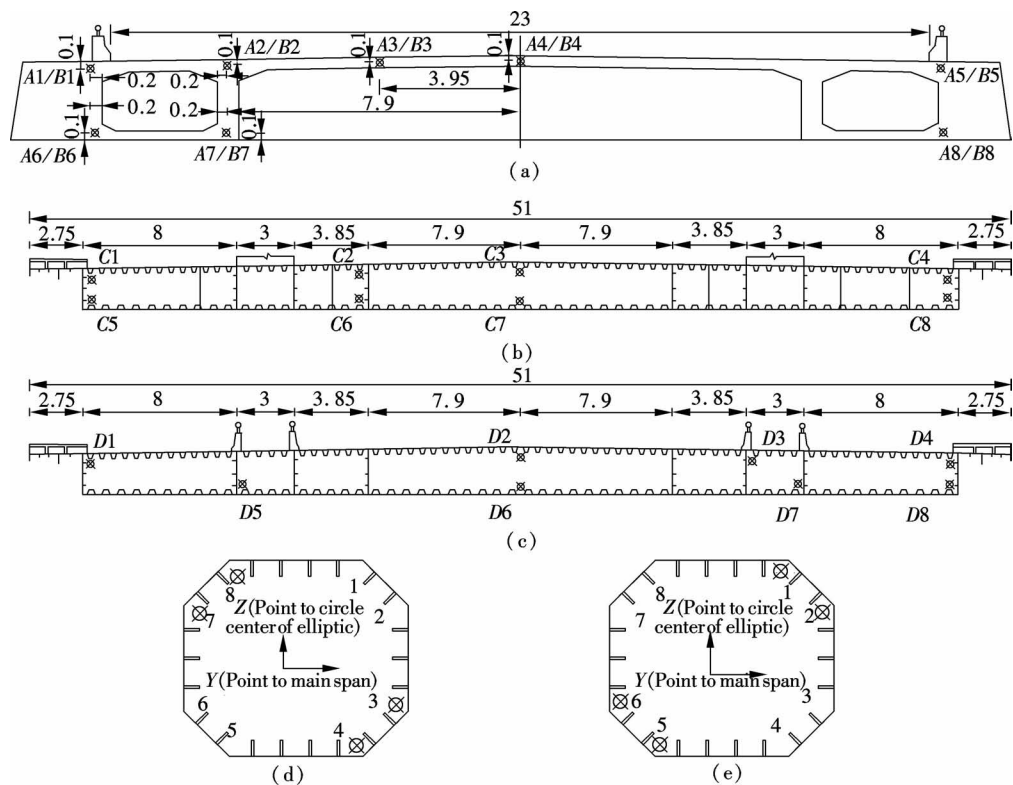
The location of transducer (unit: m) . (a) Sections A-A and B-B; (b) Section C-C; (c) Section D-D; (d) Section E-E; (e) Sections F-F and H-H
